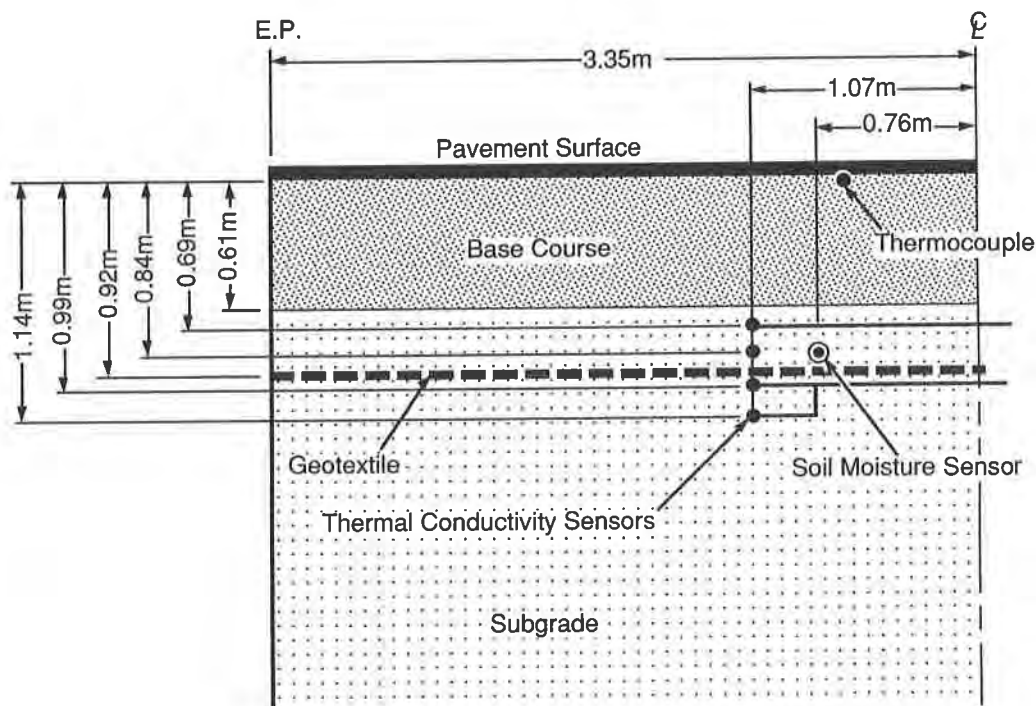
Cross-section view of test section 5 from Pittsburg, New Hampshire, geotextile test section.
